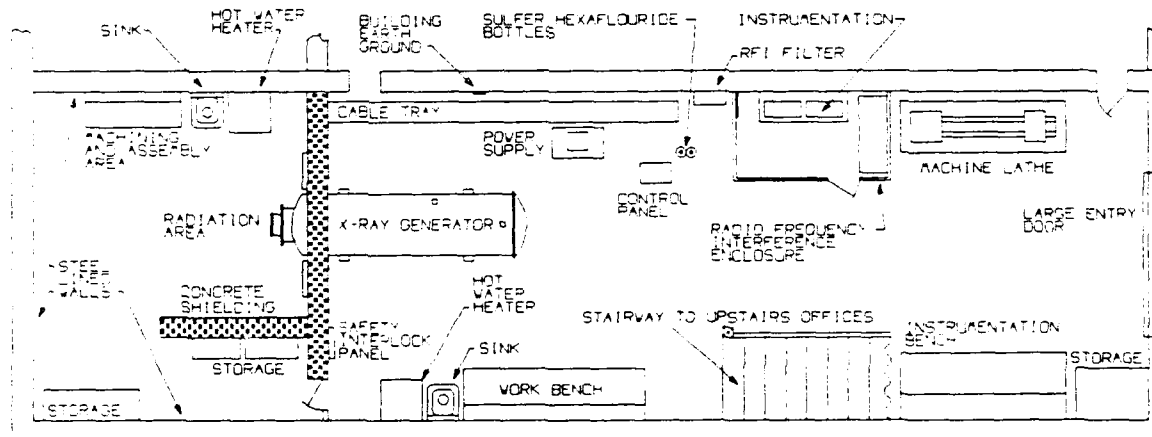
NPS FXR Facility Layout (1st Floor)
